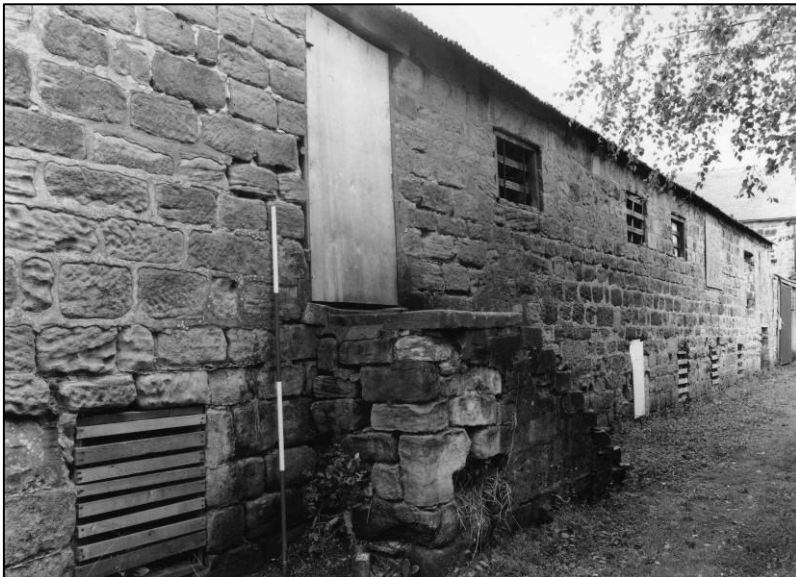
Central part of E elevation showing external steps, looking W (photo 2/2).
